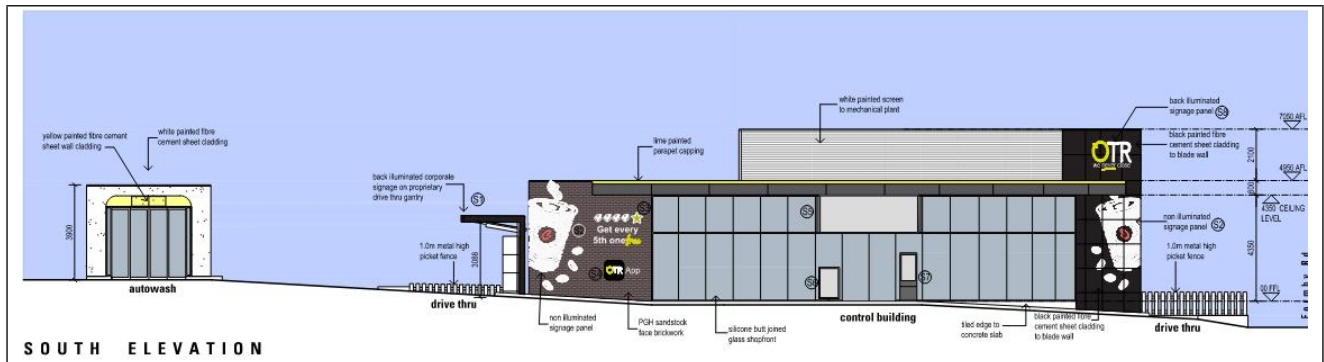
Southern elevation viewed from within site (Source: Ratio)
